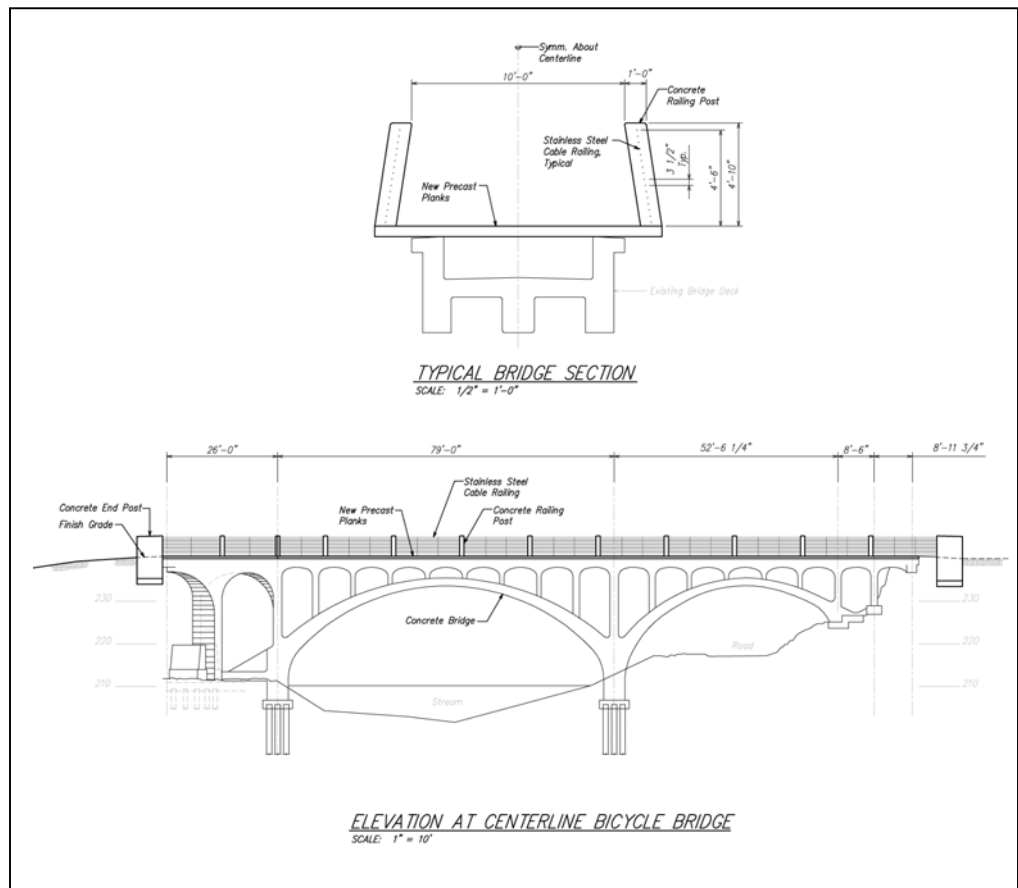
Proposed Hanama'ulu Bridge retrofit
